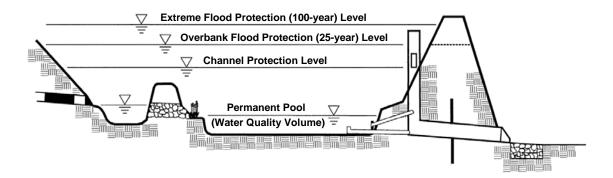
Unified Sizing Criteria Water Surface Elevations in a Stormwater (Wet) Pond
